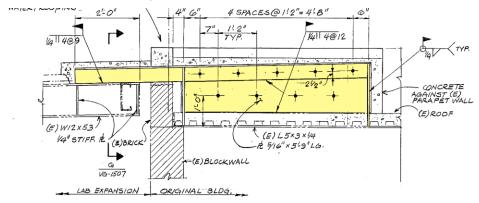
Connection of the West Lab Addition to the Original Lab Building
